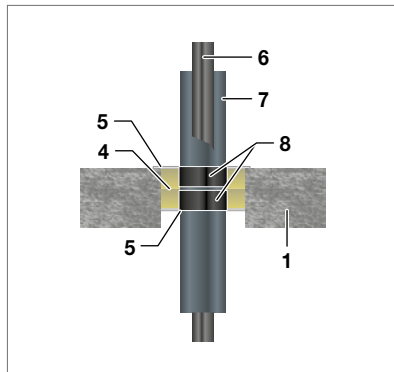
Soft firestop in the solid ceiling with Viega piping system plastic
